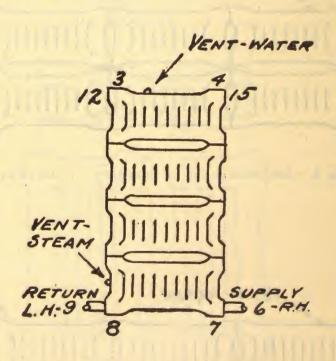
Assembled in single stack. Water or one and two pipe steam.
